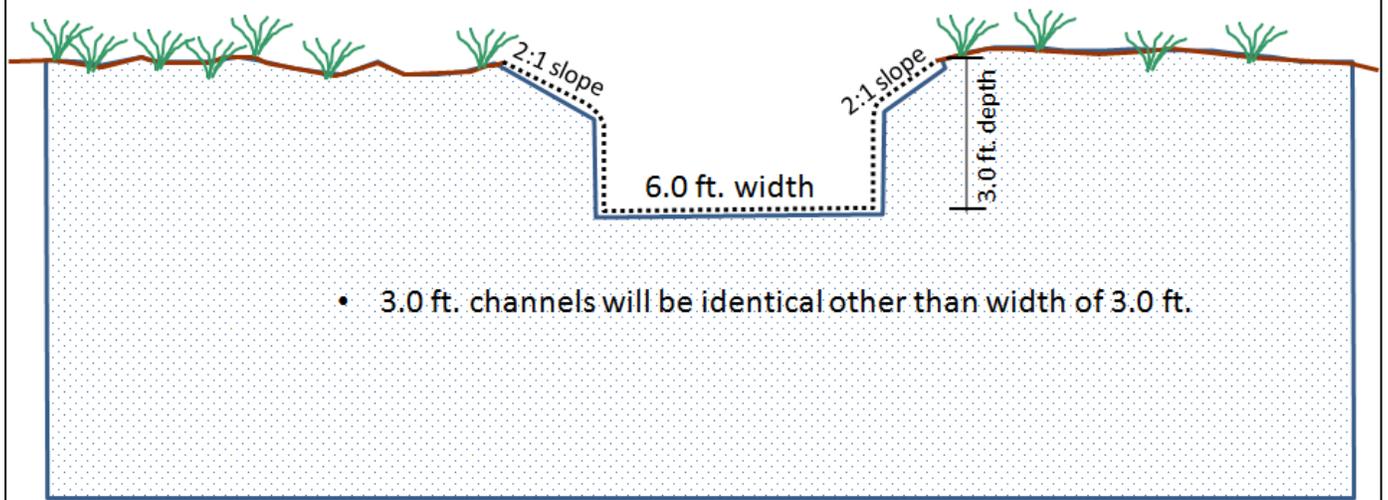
North Bank Lane typical channel depiction. Note: The terrain is varied and the depth/landform elevation will vary.
